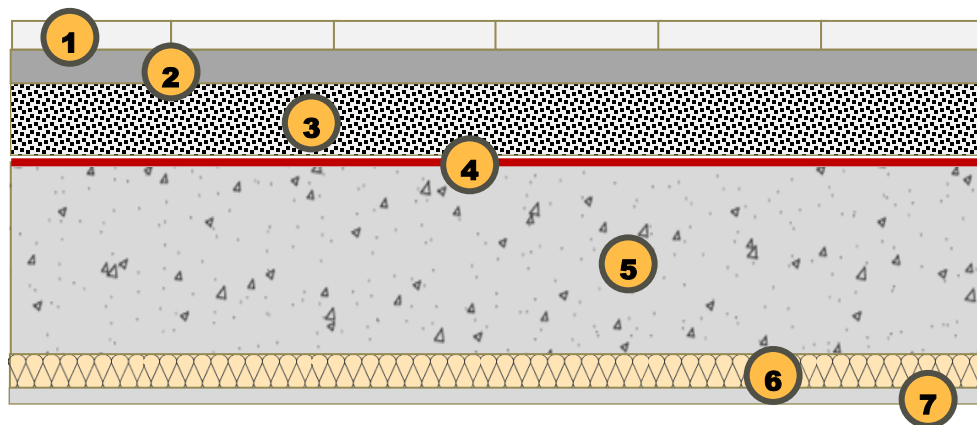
Construction detail for roof assembly: RCC slab with foam concrete insulation
